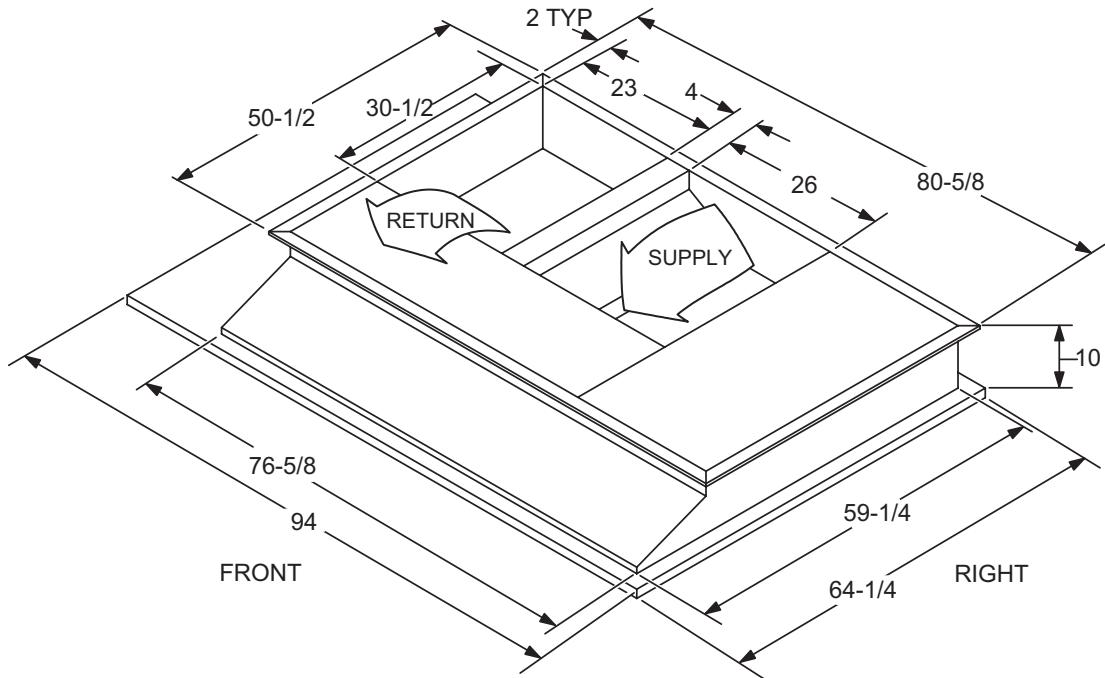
SUNLINE™ TO PREDATOR® TRANSITION ROOF CURBS
